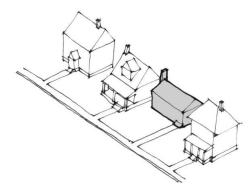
The second house from the right is not compatible with the other three houses: it is too short, too small in massing, lower foundation, and setback too far from the street.
